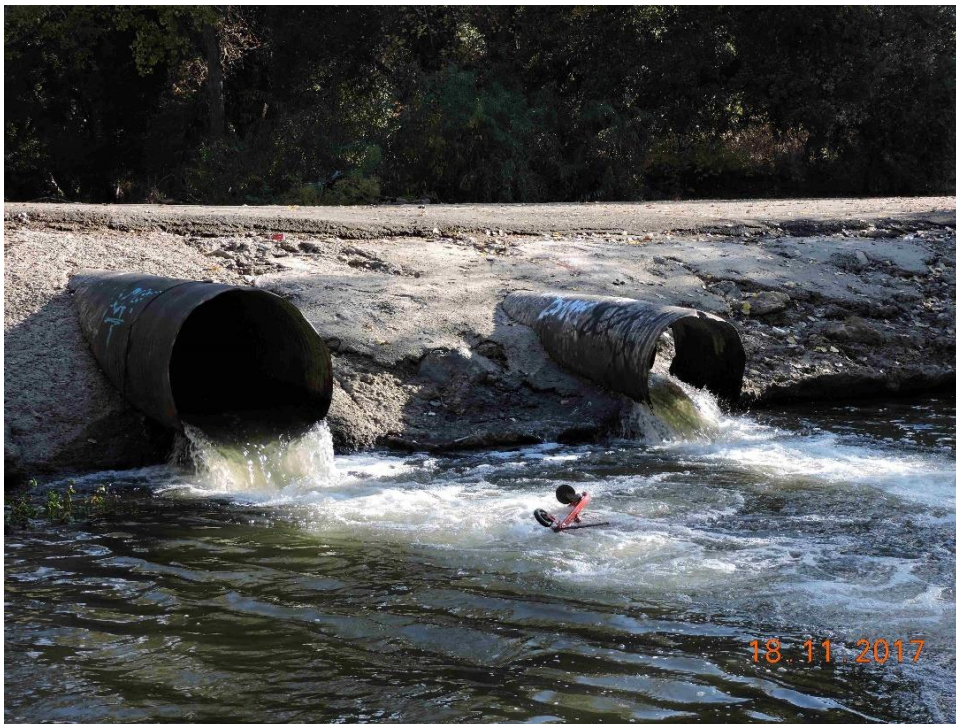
Singleton Road on 18 November 2017 at approximately 50 cfs. Possibly marginally passable through the culverts. Note the damage to culvert on the right in the picture.
